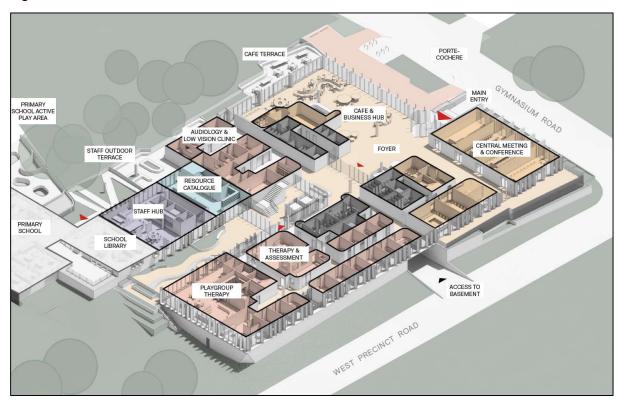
| Diagrammatic plan of Renwick Centre ground level (Source: Applicant's RtS 2021)
